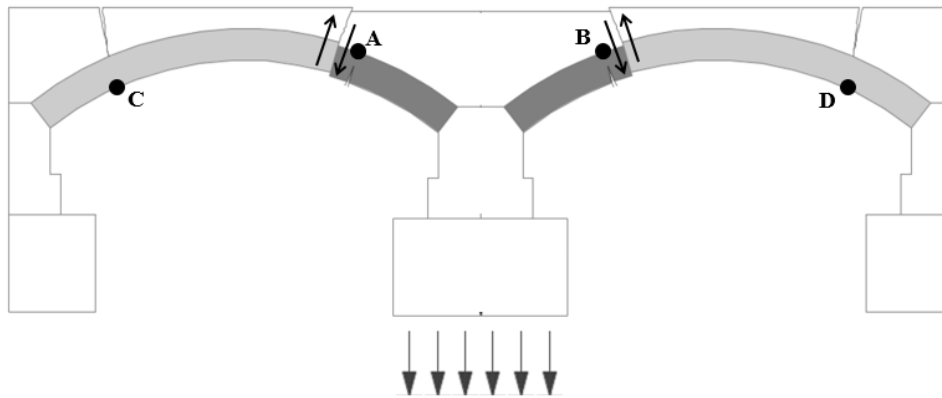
Failure mechanism for a masonry arch bridge subject to not-symmetrical scouring.
